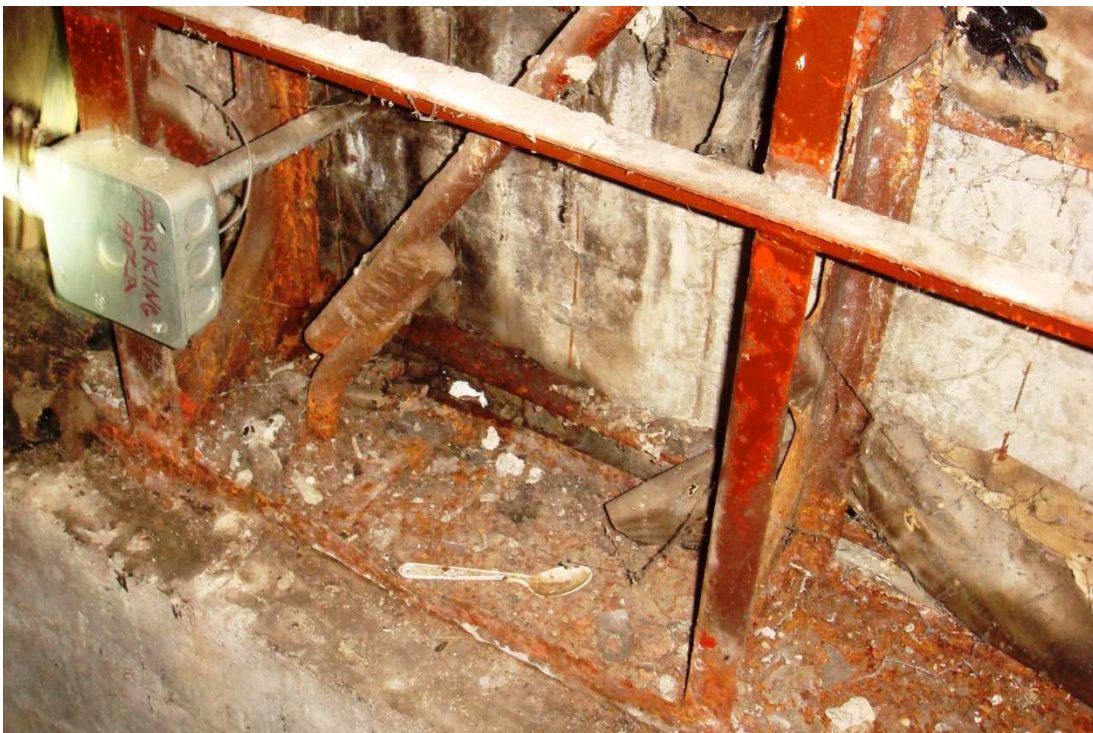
Diagonal Rod at Basement Wall (note bent anchor stub at the left and sill track corrosion)
